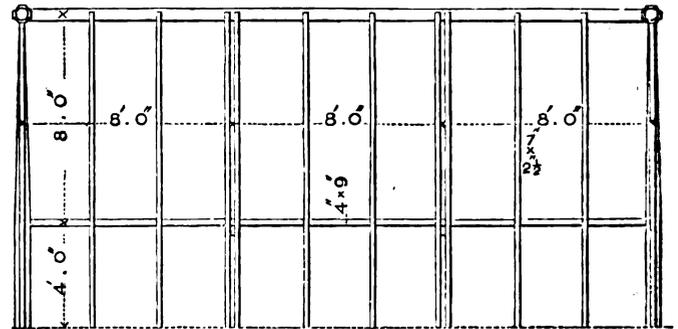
Plan of half of a 24-foot Bay of the Gallery Floor.
